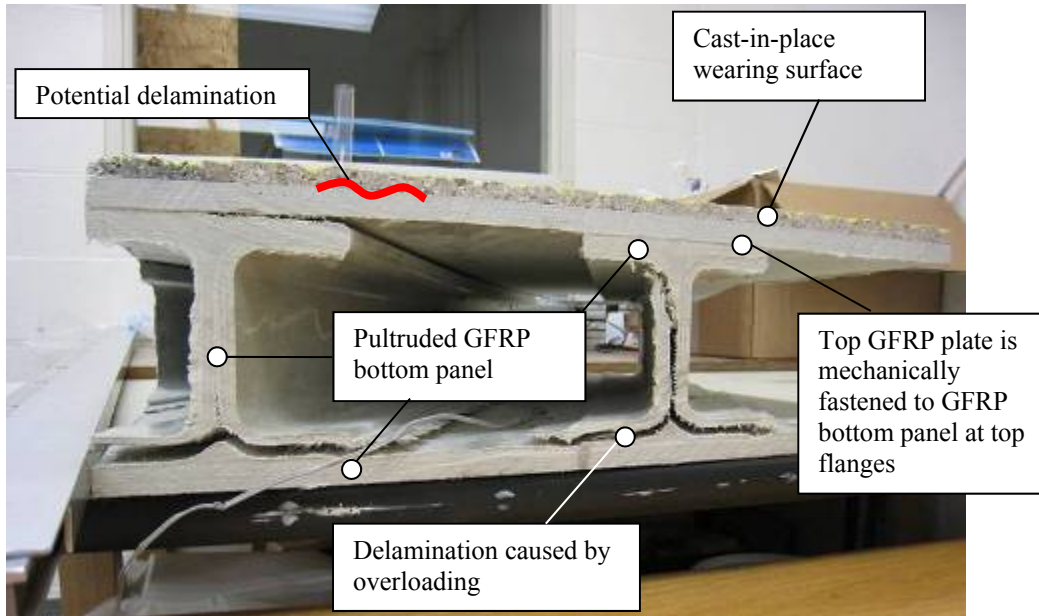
Section view of damaged GFRP bridge deck. Sample provided by UF/FDOT.
